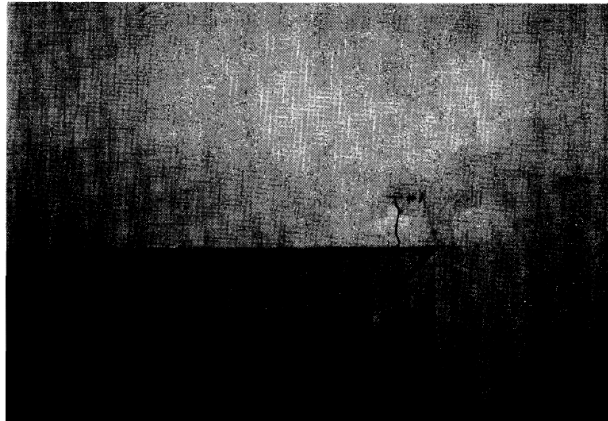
Cracking of plasterboard above the door frame observed during the testing of wall type 2 at 0.26% drift by Freeman (1971).
